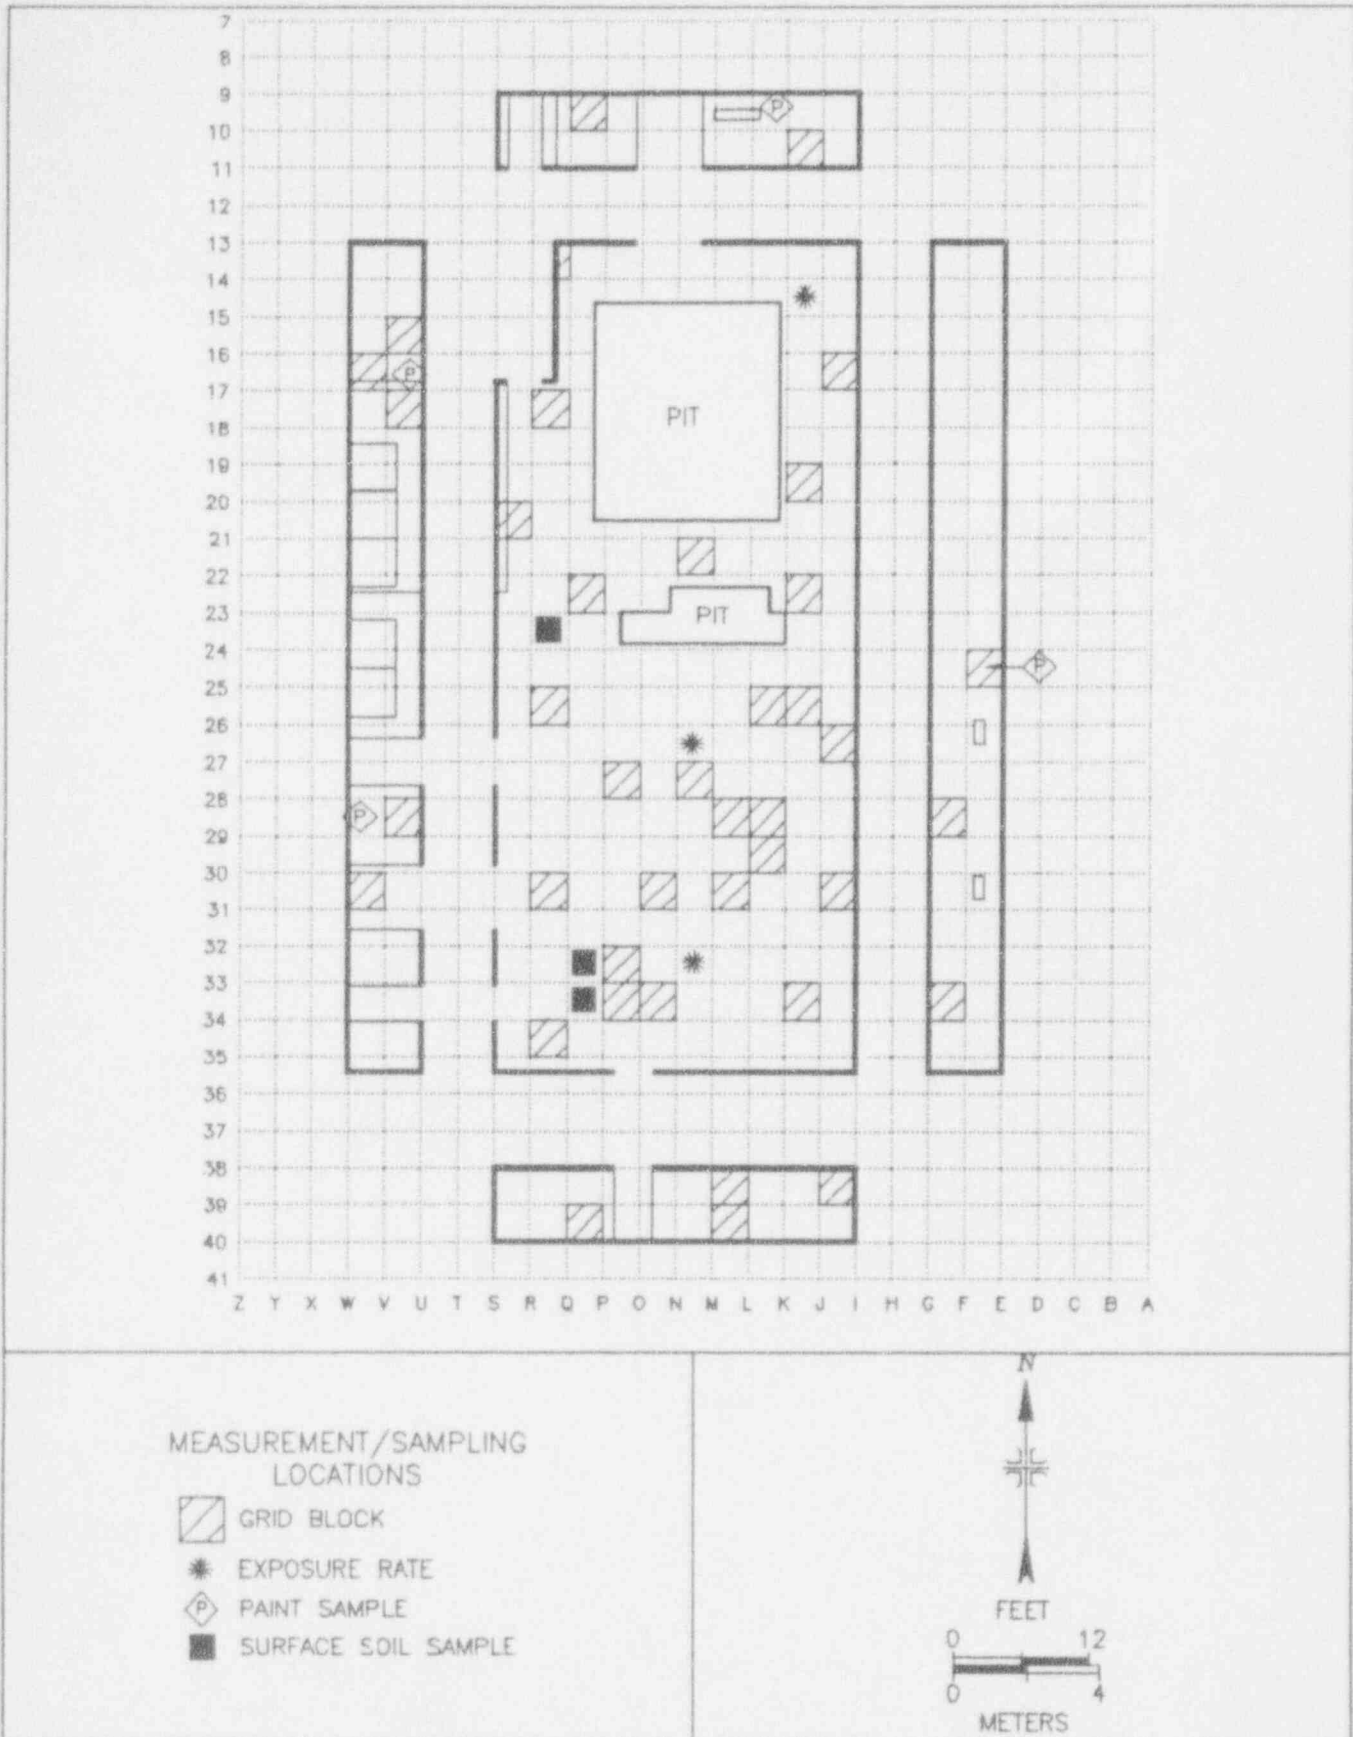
Unit 1 Main Room, Lower Walls and Floor – Measurement and Sampling Locations
